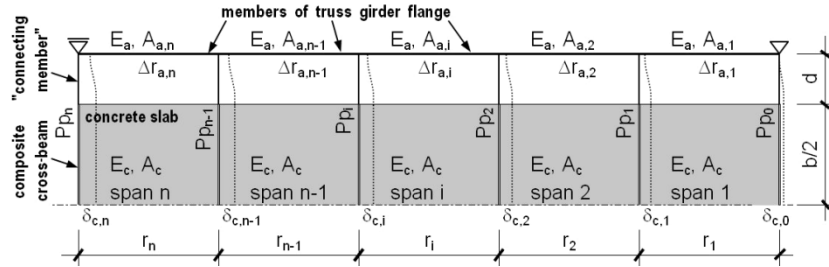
Computational model for analysis of shrinkage of concrete slab in steel-concrete composite deck of a through truss bridge
